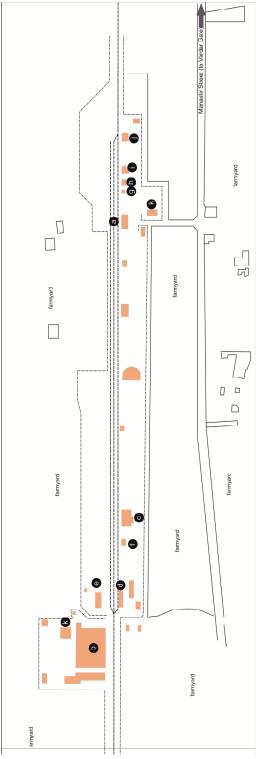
Selanik, site plan of JSC railway yard, 1899, drawing.
